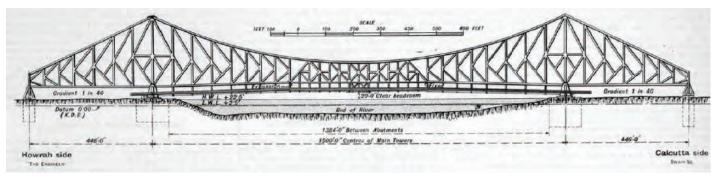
Side Elevation of Proposed New Howrah Bridge
